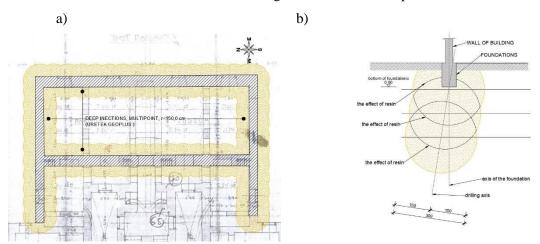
a) Ground plan disposition of the performed reinforcement of the foundation soil b) Characteristic cross-section of the expansion resin spread and injection level
